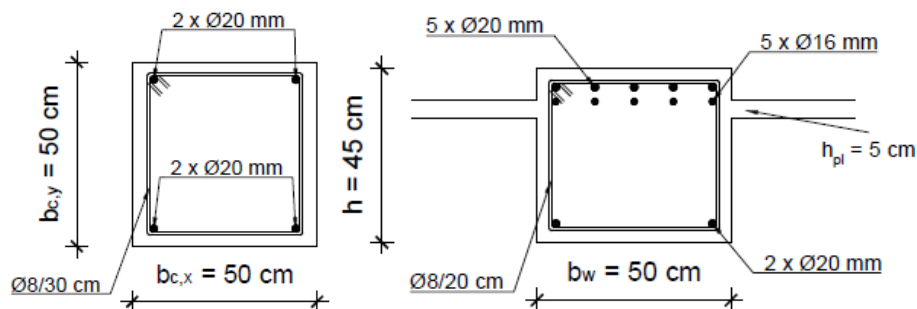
Reinforcement of the characteristic column (left) and beam (right)
